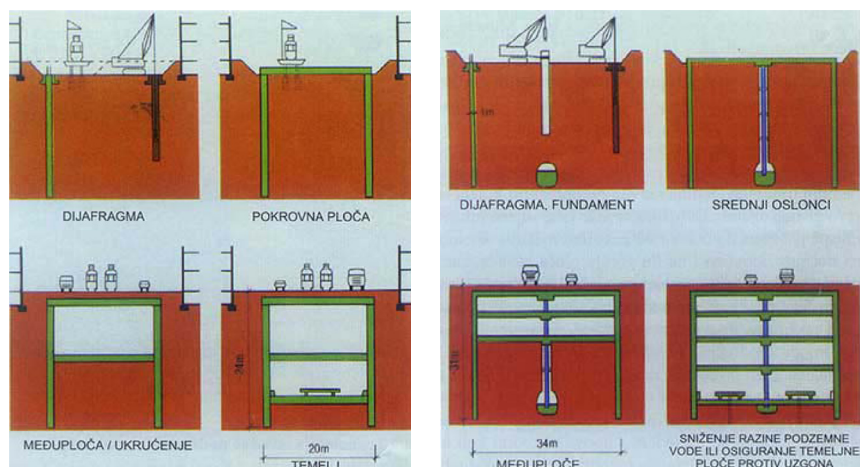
Construction of metro stations by Top-Down method (case of Munich subway) : construction of diaphragm with roof slab (left) and with roof slab and central column (right).
